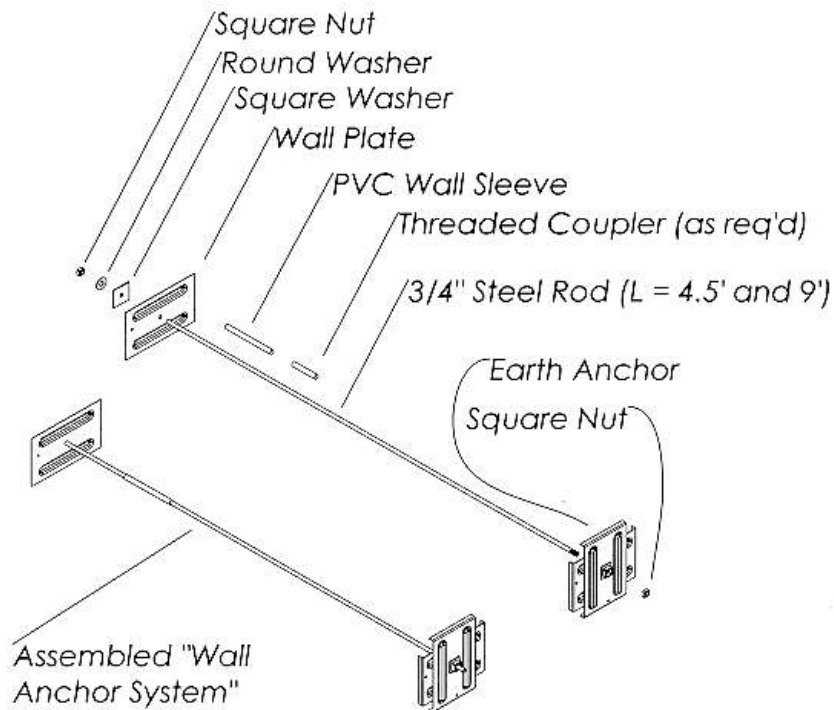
\*—WALL ANCHOR ASSEMBLY COMPONENTS
